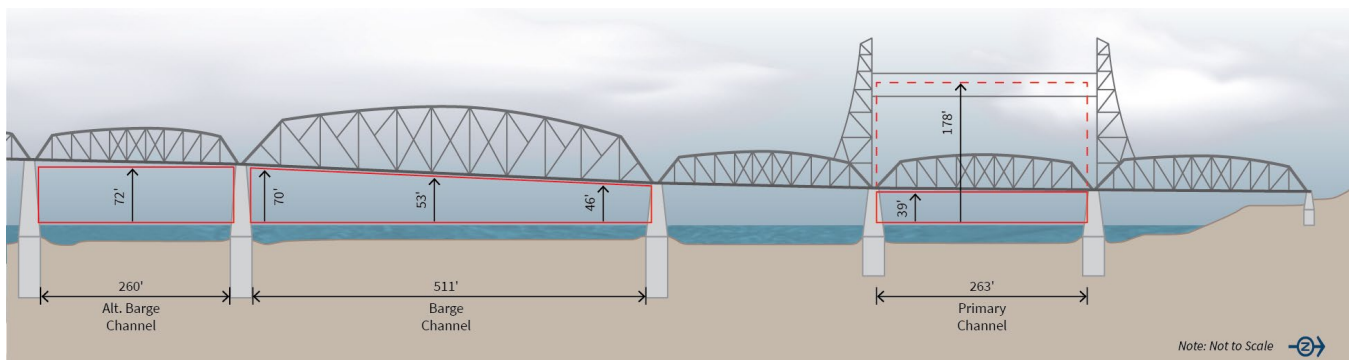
Existing Navigation Channels Under the Interstate Bridge and BNSF Railway Bridge
